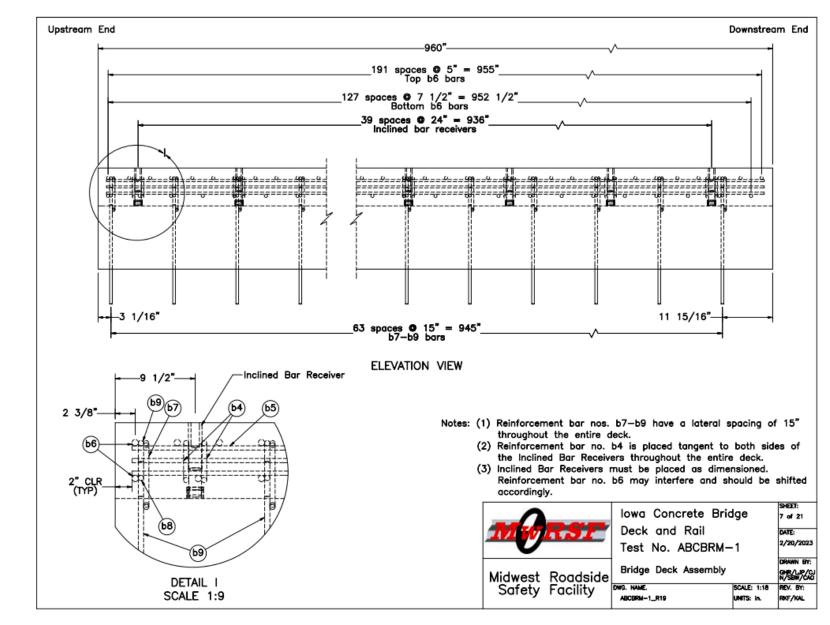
Bridge Deck Assembly, Test No. ABCBRM-1
